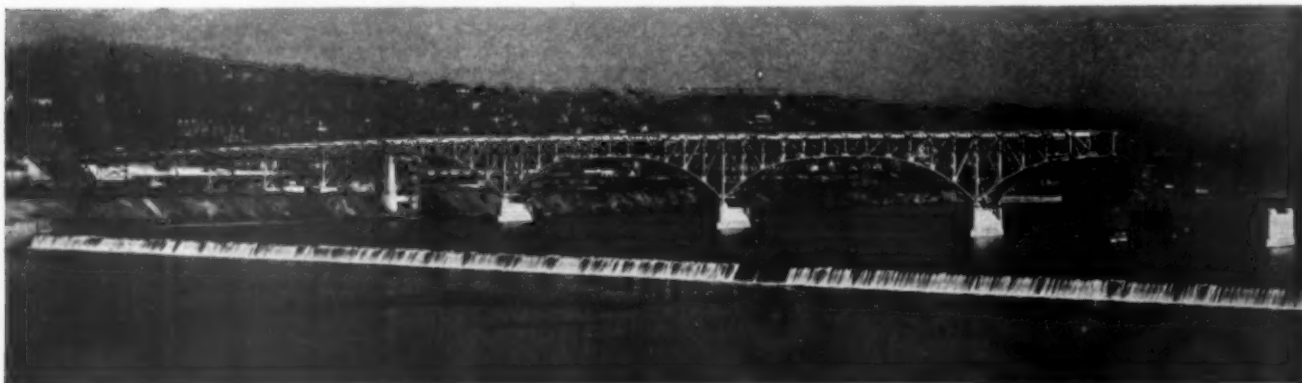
The New \$2,500,000 Highland Park Bridge Being Built Across the Allegheny River Near Pittsburgh. Malleable Iron Railing, Similar to That Used on the Pittsburgh-Homestead High Level Bridge, Will Be Installed. It Is Shown in the Next Picture.
